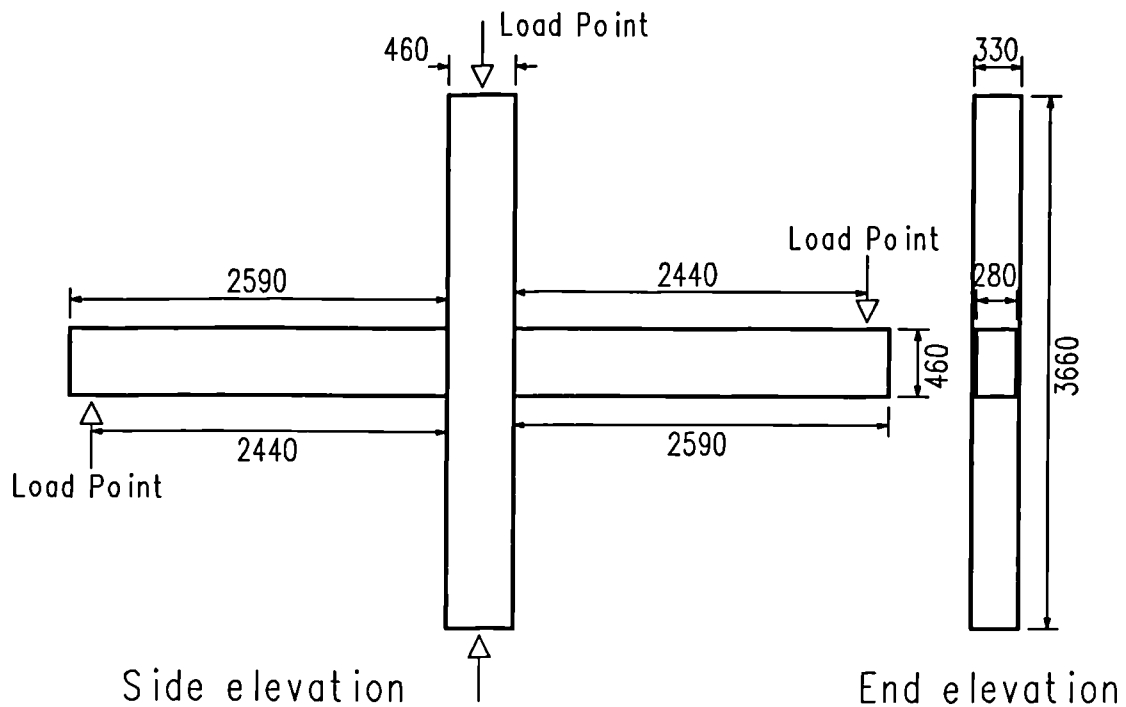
Specimen layout for strong column (dimensions in mm)
